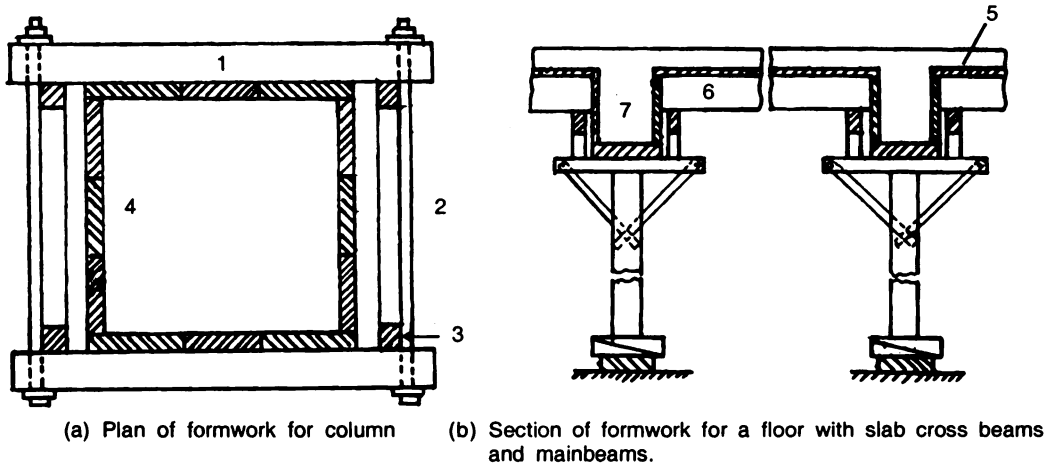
Types of formwork for RC construction: 1. Yoke, 2. Bolt, 3. Wedges, 4. Planks for sides of column, 5. Slab, 6. Cross beam, 7. Main beam.
